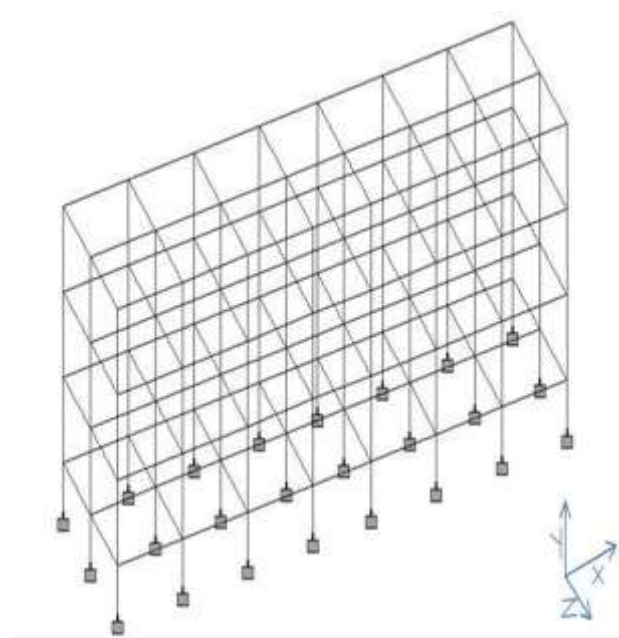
Three-dimensional view of G+3 Reinforced concrete building
